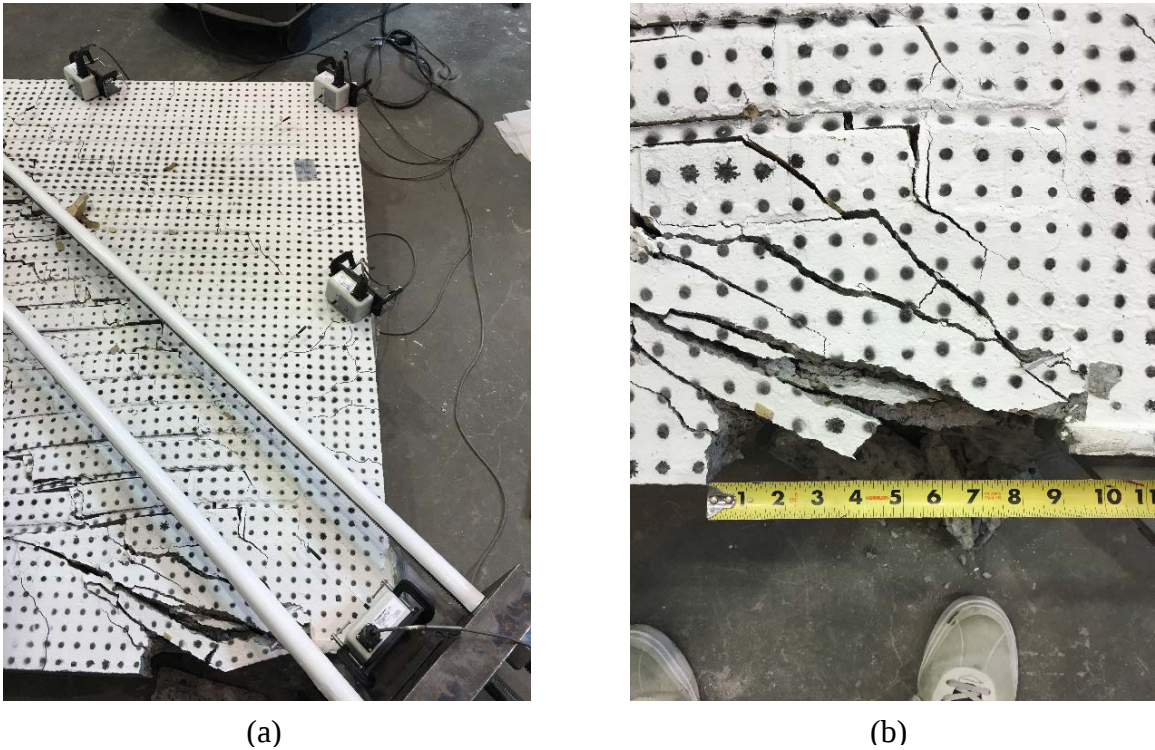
Shear failure in the concrete frame shown in (a) the bottom corner of the wall with (b) a measurement of the amount of damage observed
